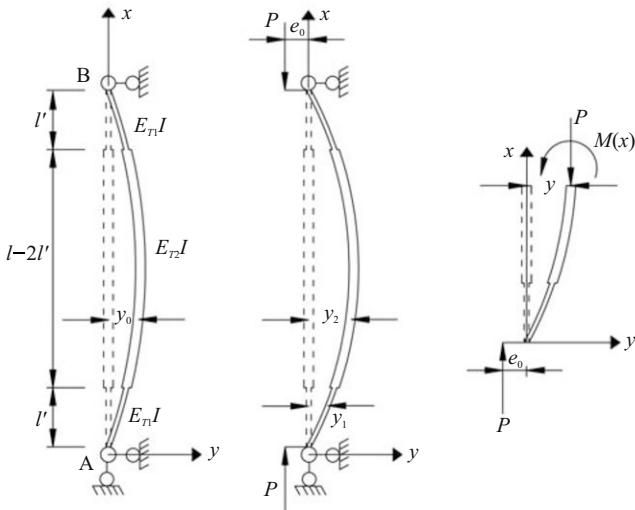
Mechanical model of the steel column with partial fire protection damage
